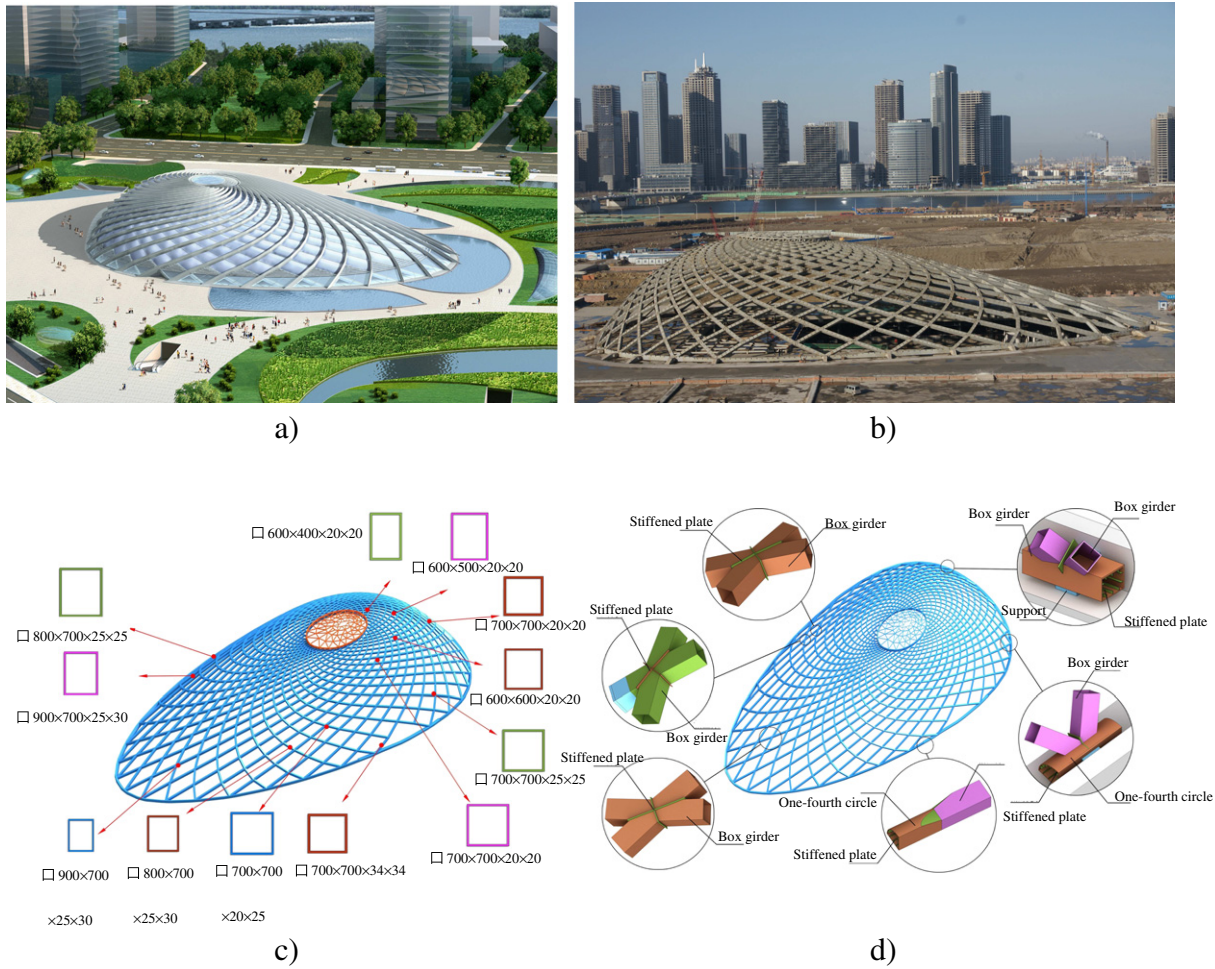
Schematic of railway station building of Yujiapu. a) Effect picture, b) actual picture after unloading process, c) section of box girder (unit: mm) and d) nodal style.
